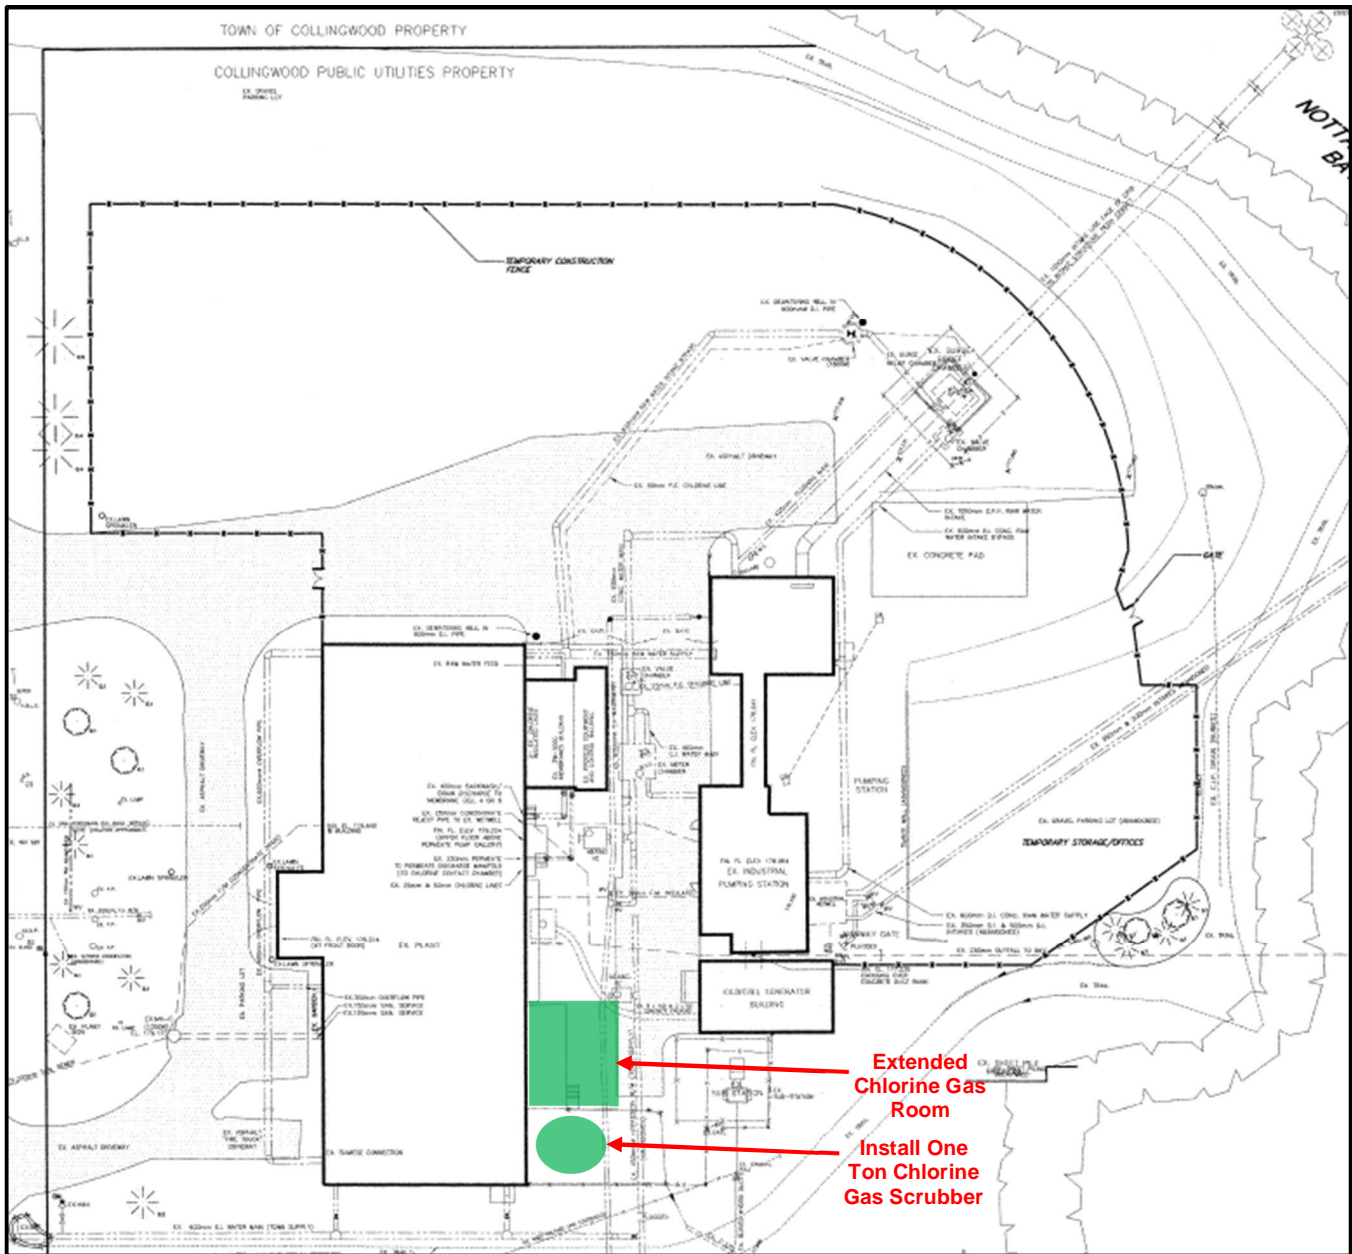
Proposed Extension of Chlorine Building and Addition of Chlorine Gas Scrubber
